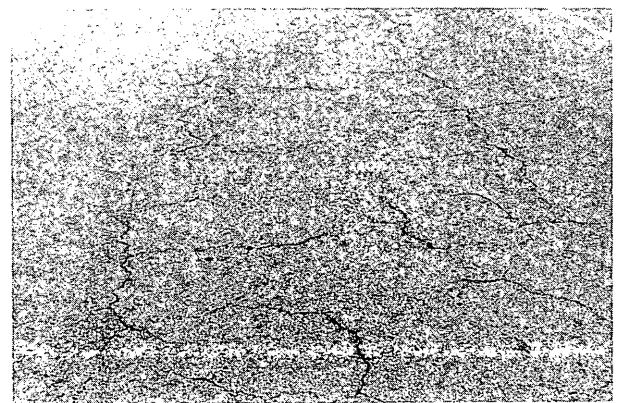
Typical block cracking in SEA section of Test Road 3 (KFUPM).
